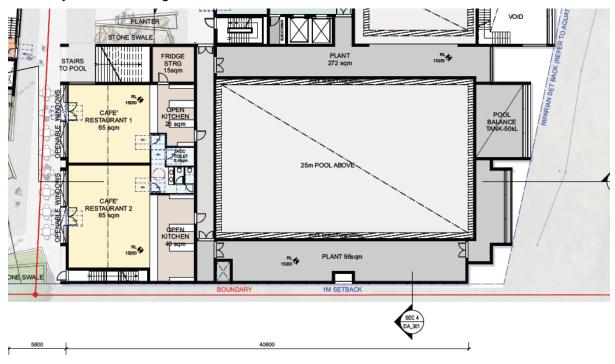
Previous Ground Floor Plan (Source: Drawing No. DA 102 – Bennett Murada Architects)
